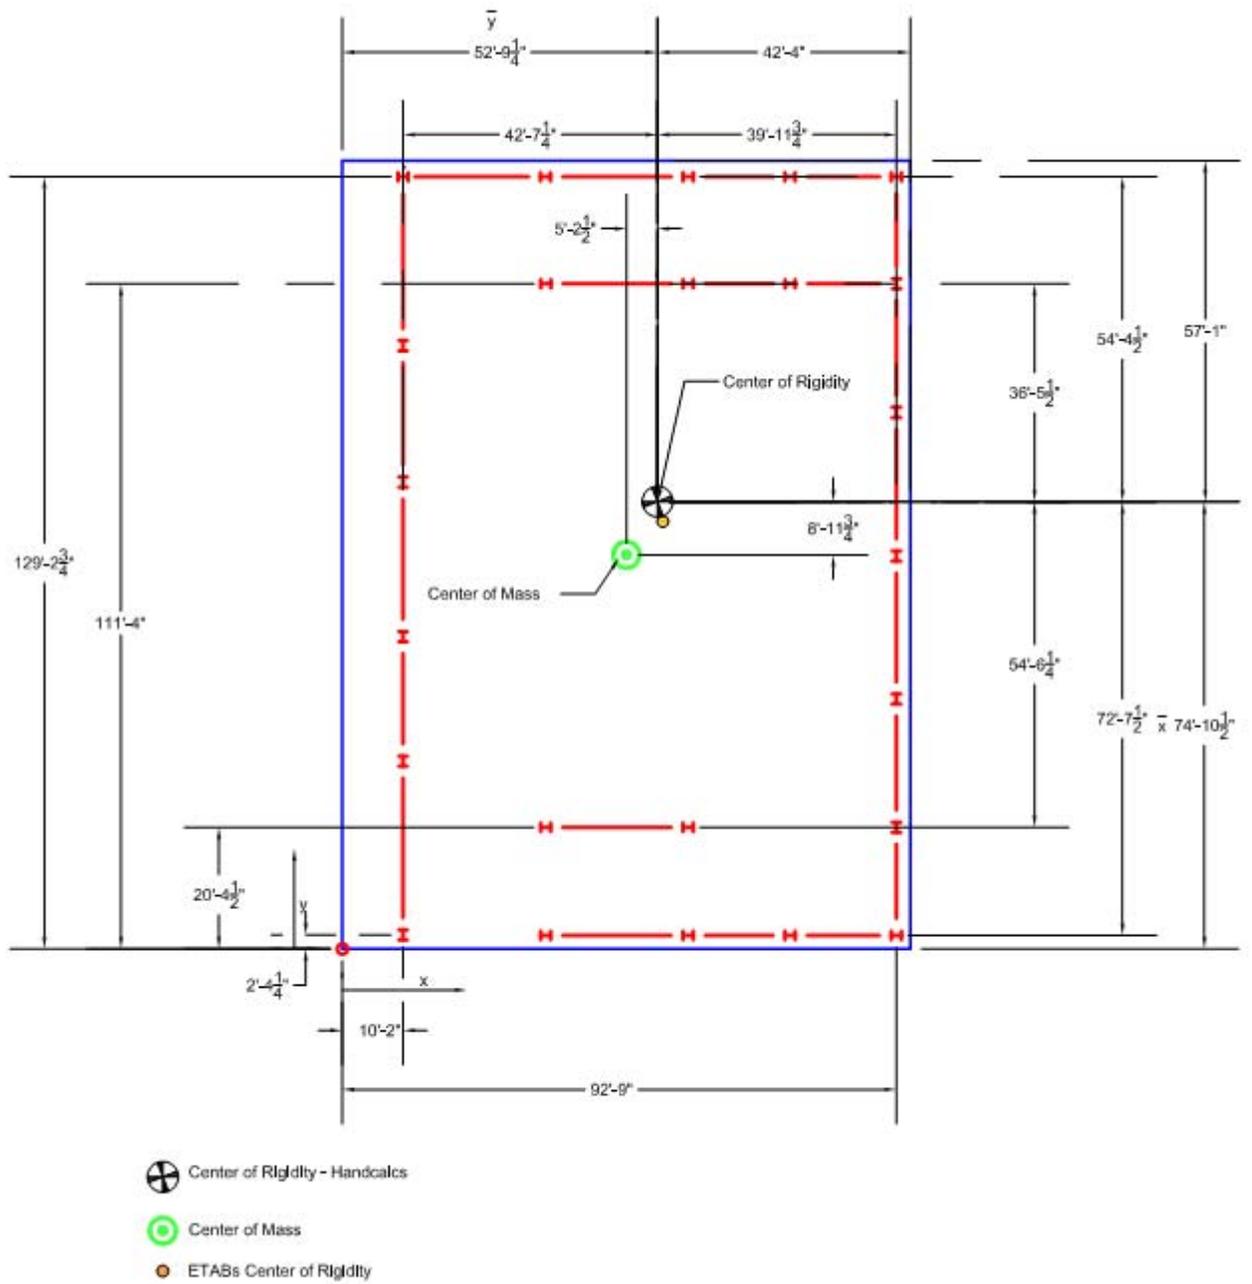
Center of Rigidity for Ground Floor-3rd Floor
